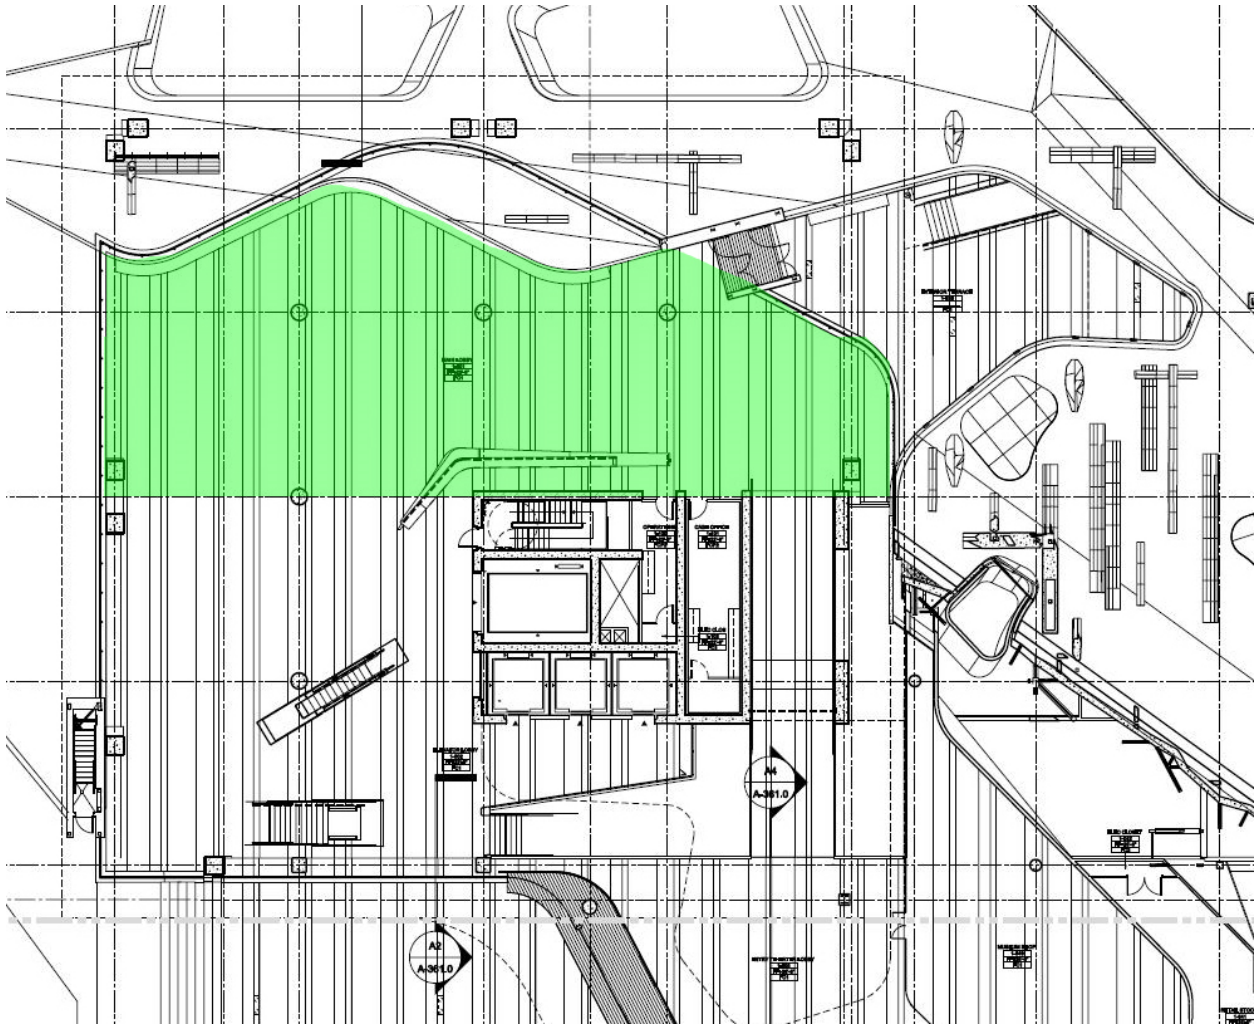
, Ground Level Floor Plan – Main Lobby, North Section
